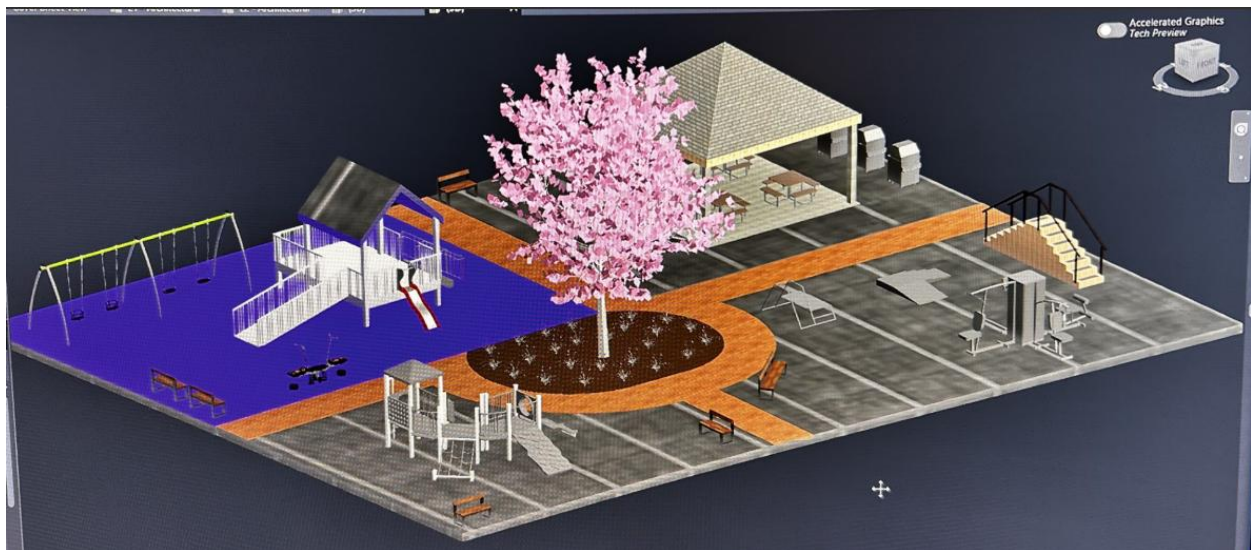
Playground Plan View — Layout of play zones, accessible surfacing, seating, and sensory elements.
